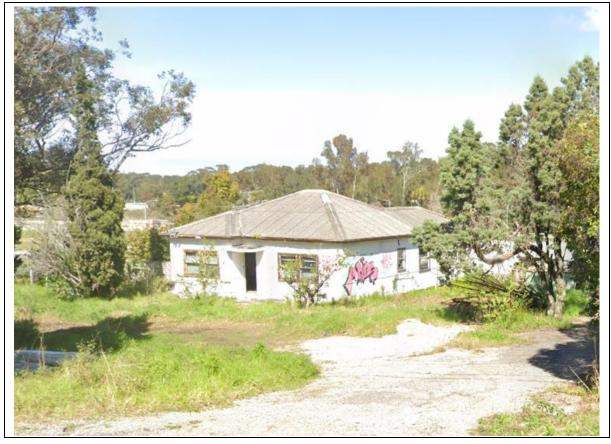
Existing Buildings and Structures on 45 Warriewood Road
